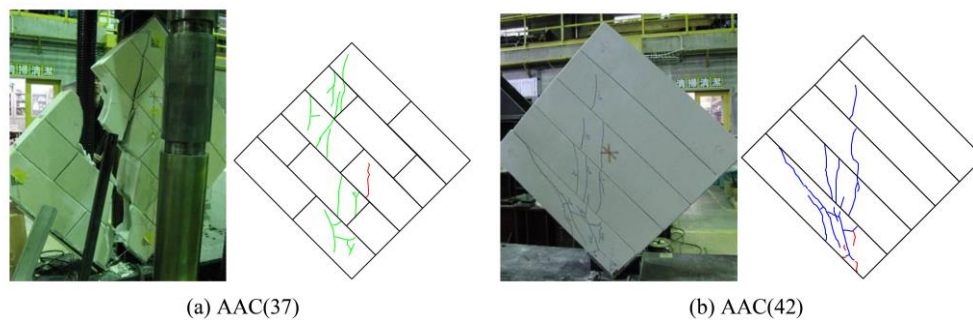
Final cracking patterns and pictures of the specimens at the end of shear test
